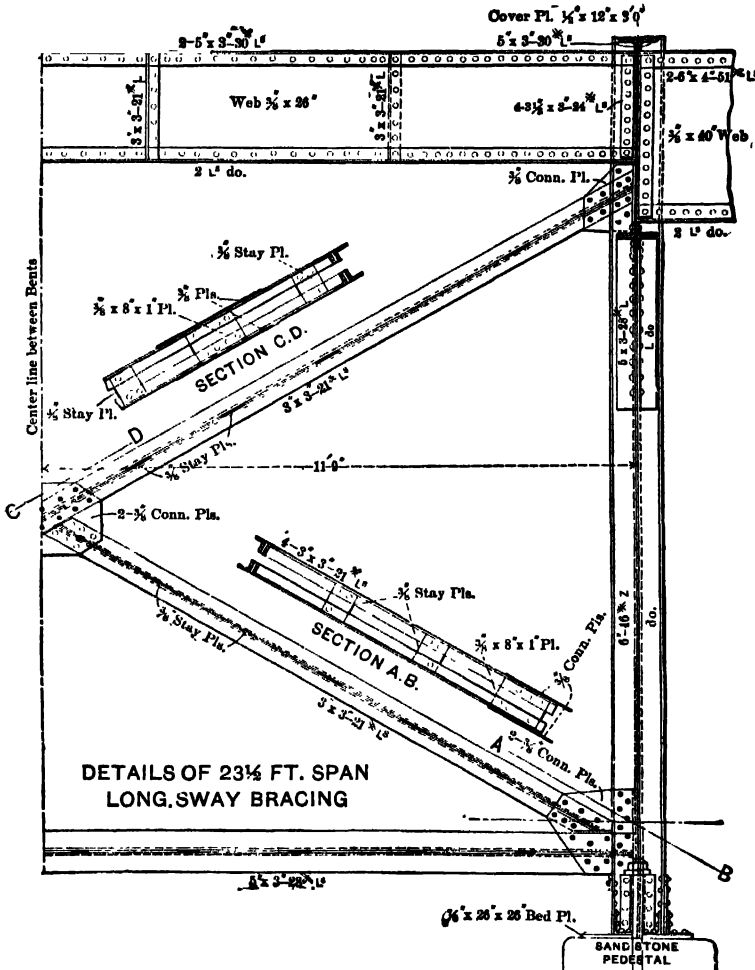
Half Elevation of Tower for Elevated Railroads.
